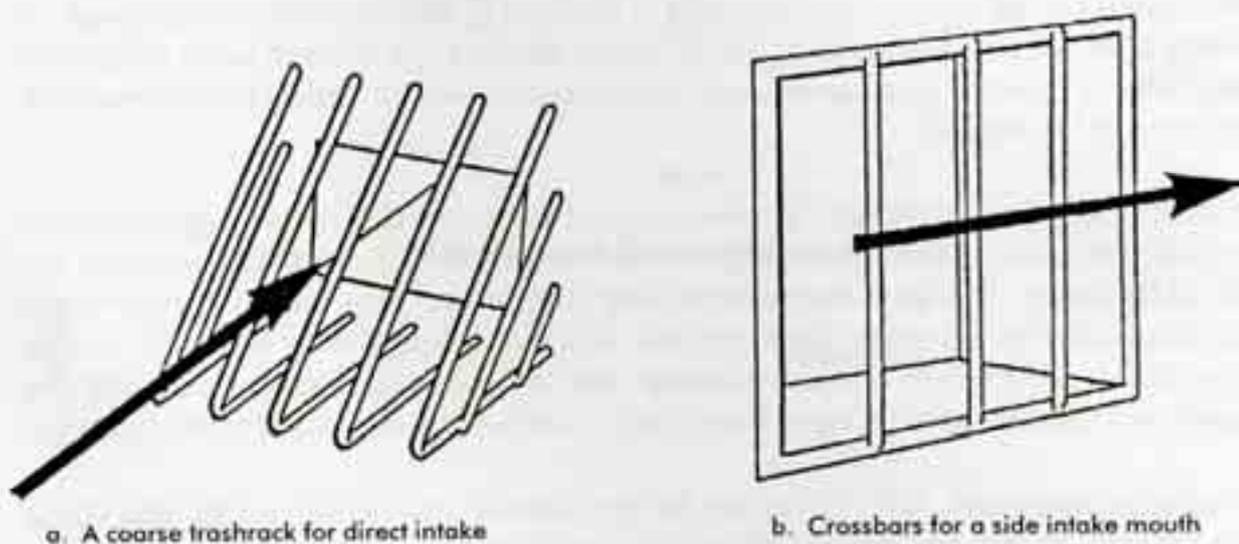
A Coarse Trashrack and Crossbars for the Intake
